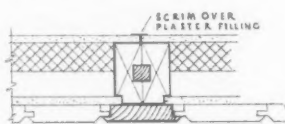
, scrimmed joint between load-bearing panels; cover fillet externally (the "Riley-Newsum" house).
